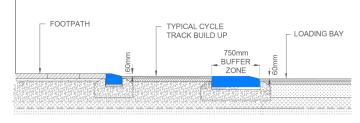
Proposed Loading Bay Cross Section with Chamfered Kerbs
